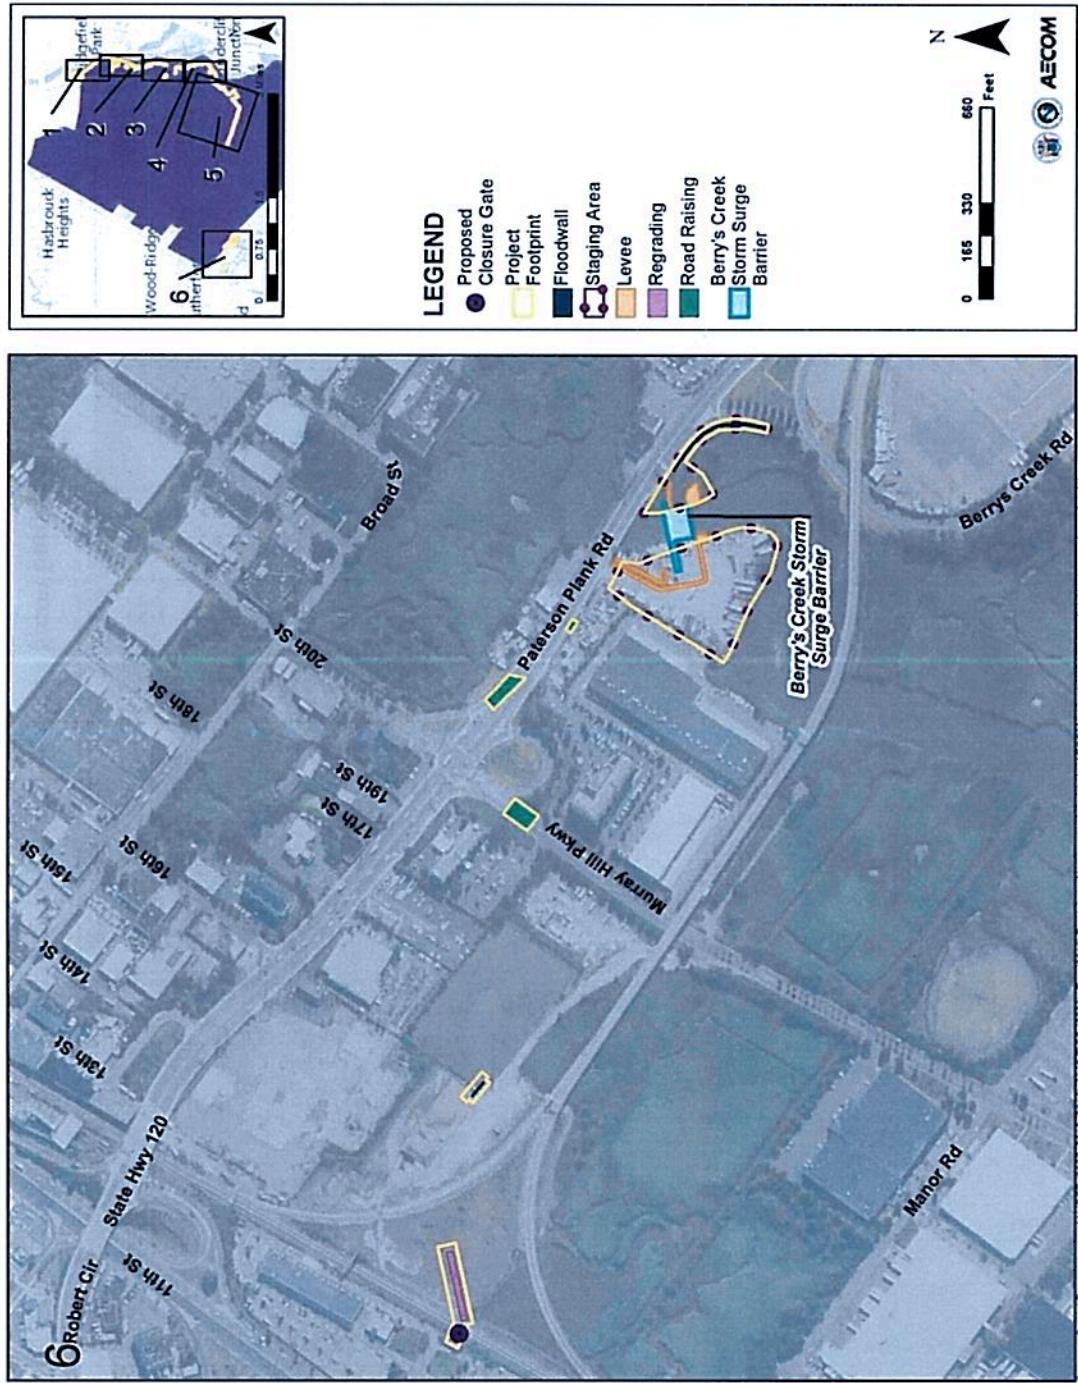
Alternative 1 LOP (Berry's Creek Storm Surge Barrier; Figure 4 of 4)
